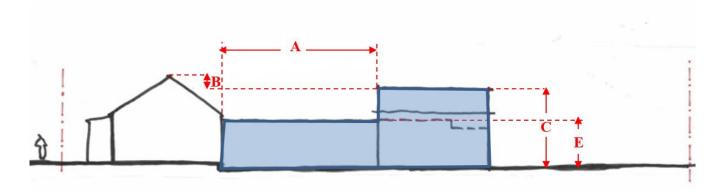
Cross section of an indicative lot in Paddington, illustrating the principal building form, linking structure and pavilion.
